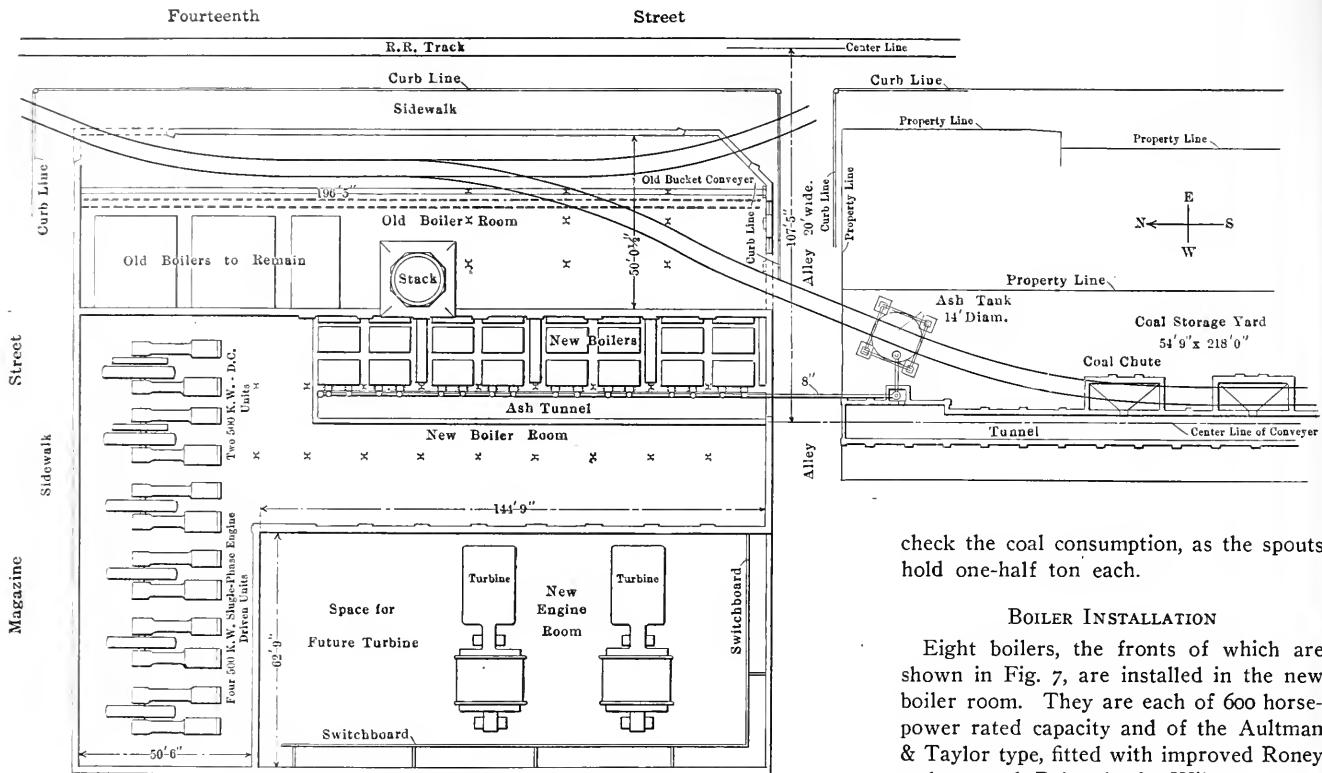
GENERAL PLAN OF YARDS AND PLANT
